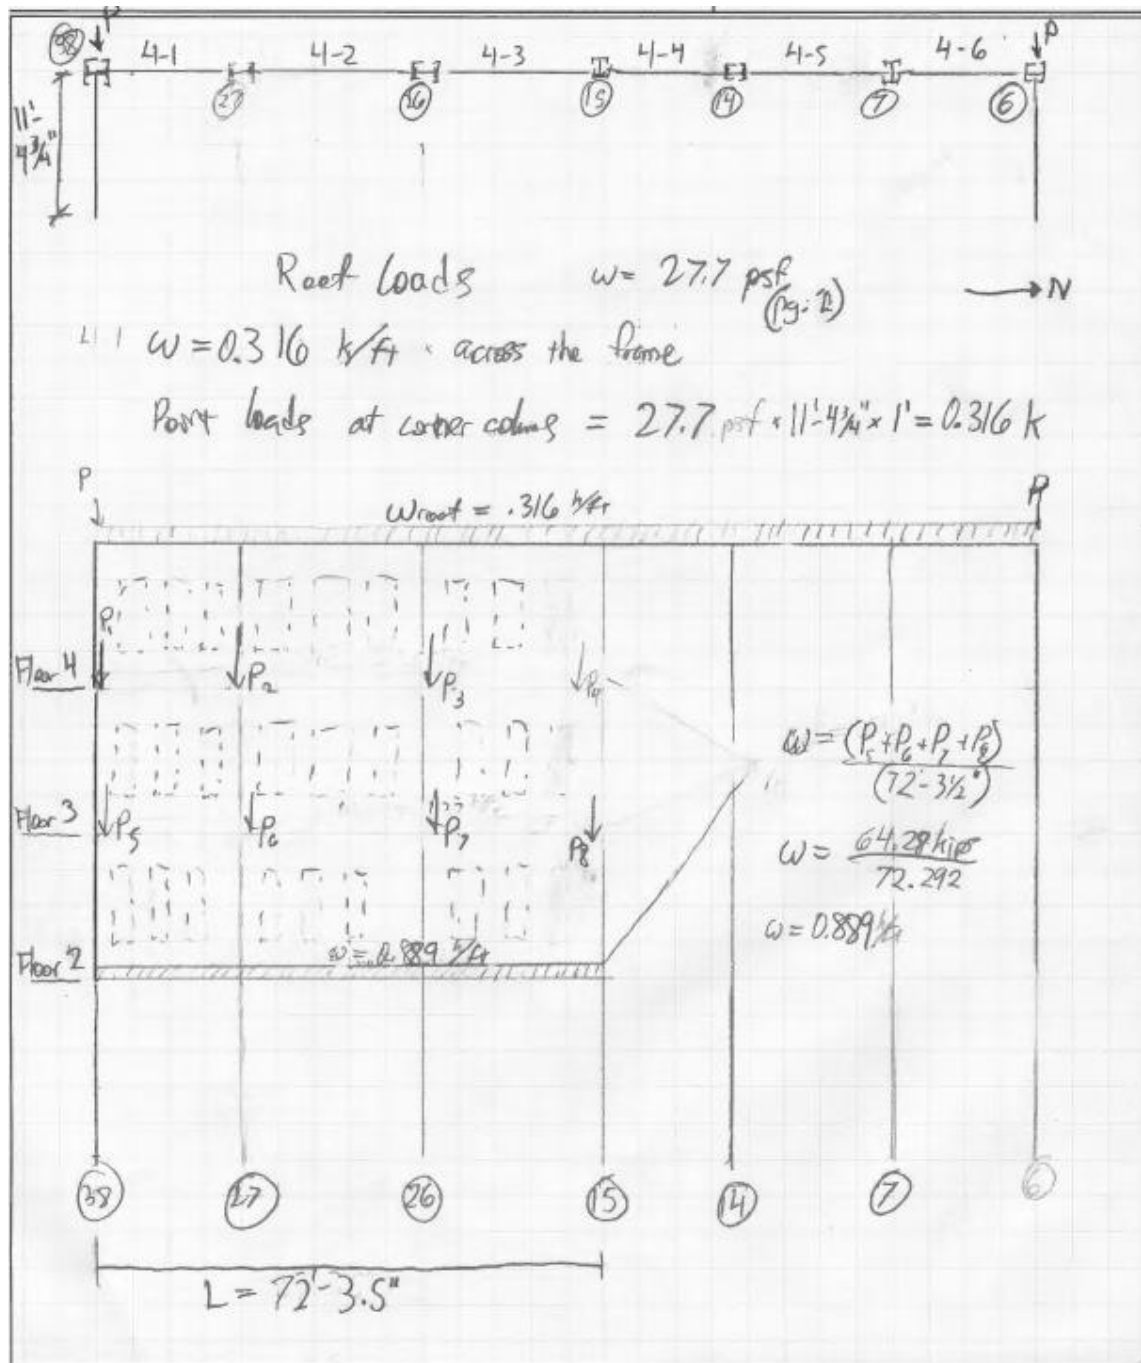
Calculations for roof and wall loads – final load distributions
